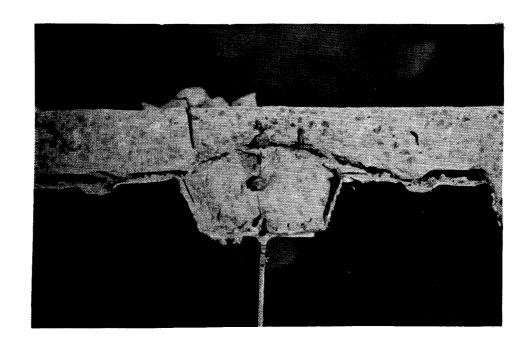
Shear Failure Plane in Concrete Slab of Full-Size Stub-Girder, Directly above South Interior Stub
